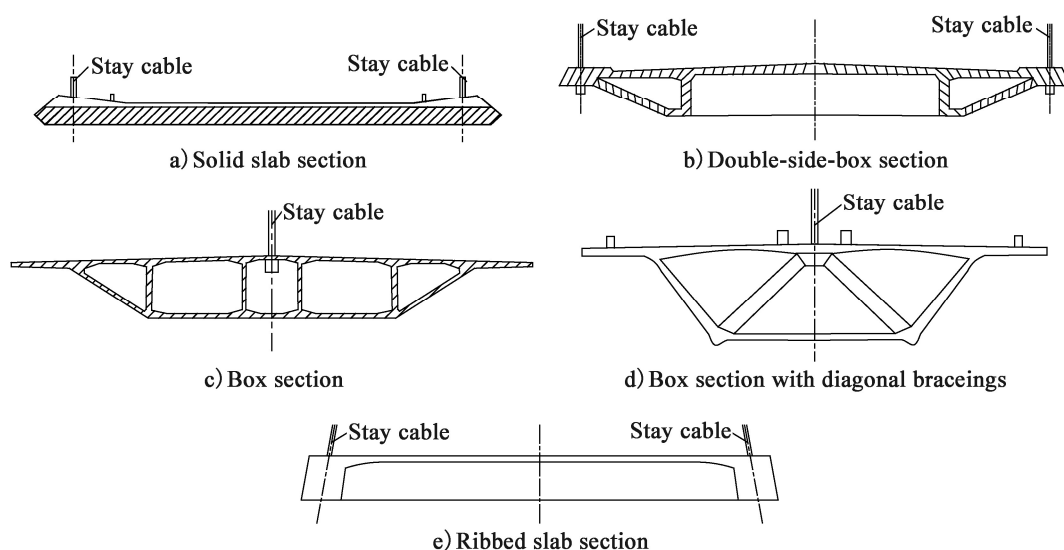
Typical cross sections of the main concrete girder in a cable-stayed bridge
